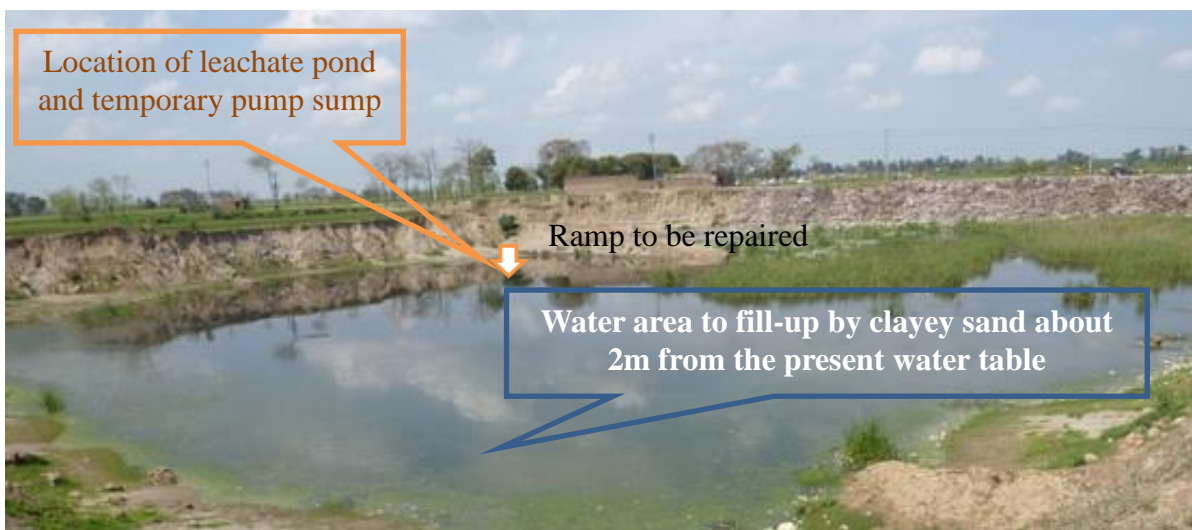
Leachate Condition of Gondlanwala Landfill Site
